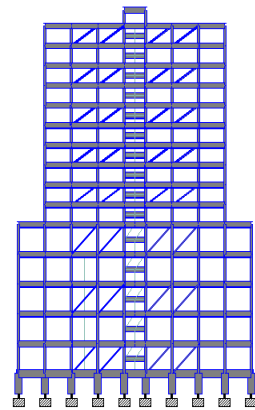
Elevation View of Proposed Structure M-II (Z-Direction)
